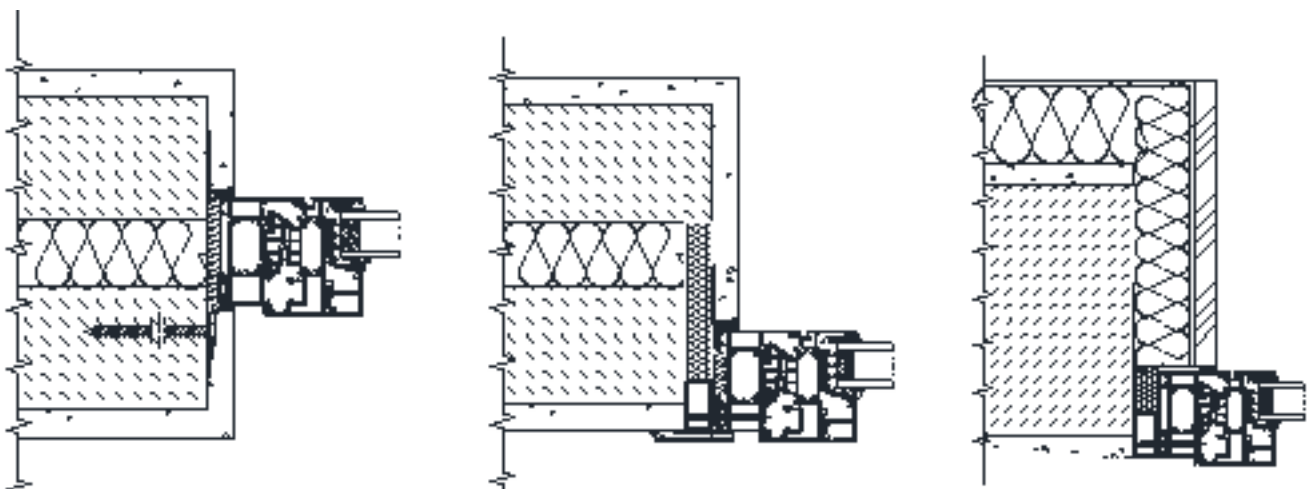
Architectural drawings with different position of the frame in the masonry (Alumil)
